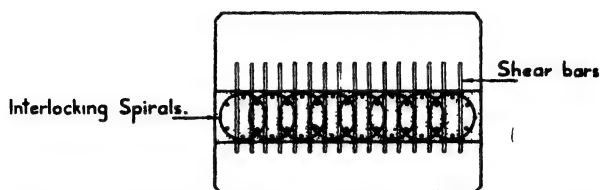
Cross Section of Crown Hinge, Warrington Bridge.
